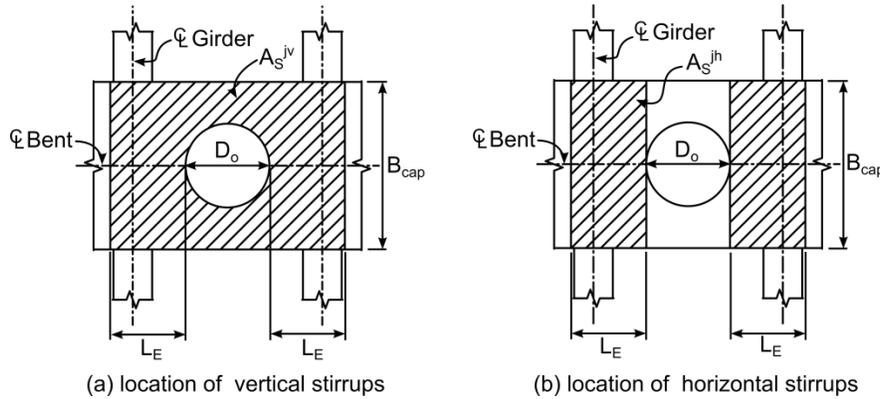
Required location of (a) vertical and (b) horizontal stirrups for the embedded ring connection
